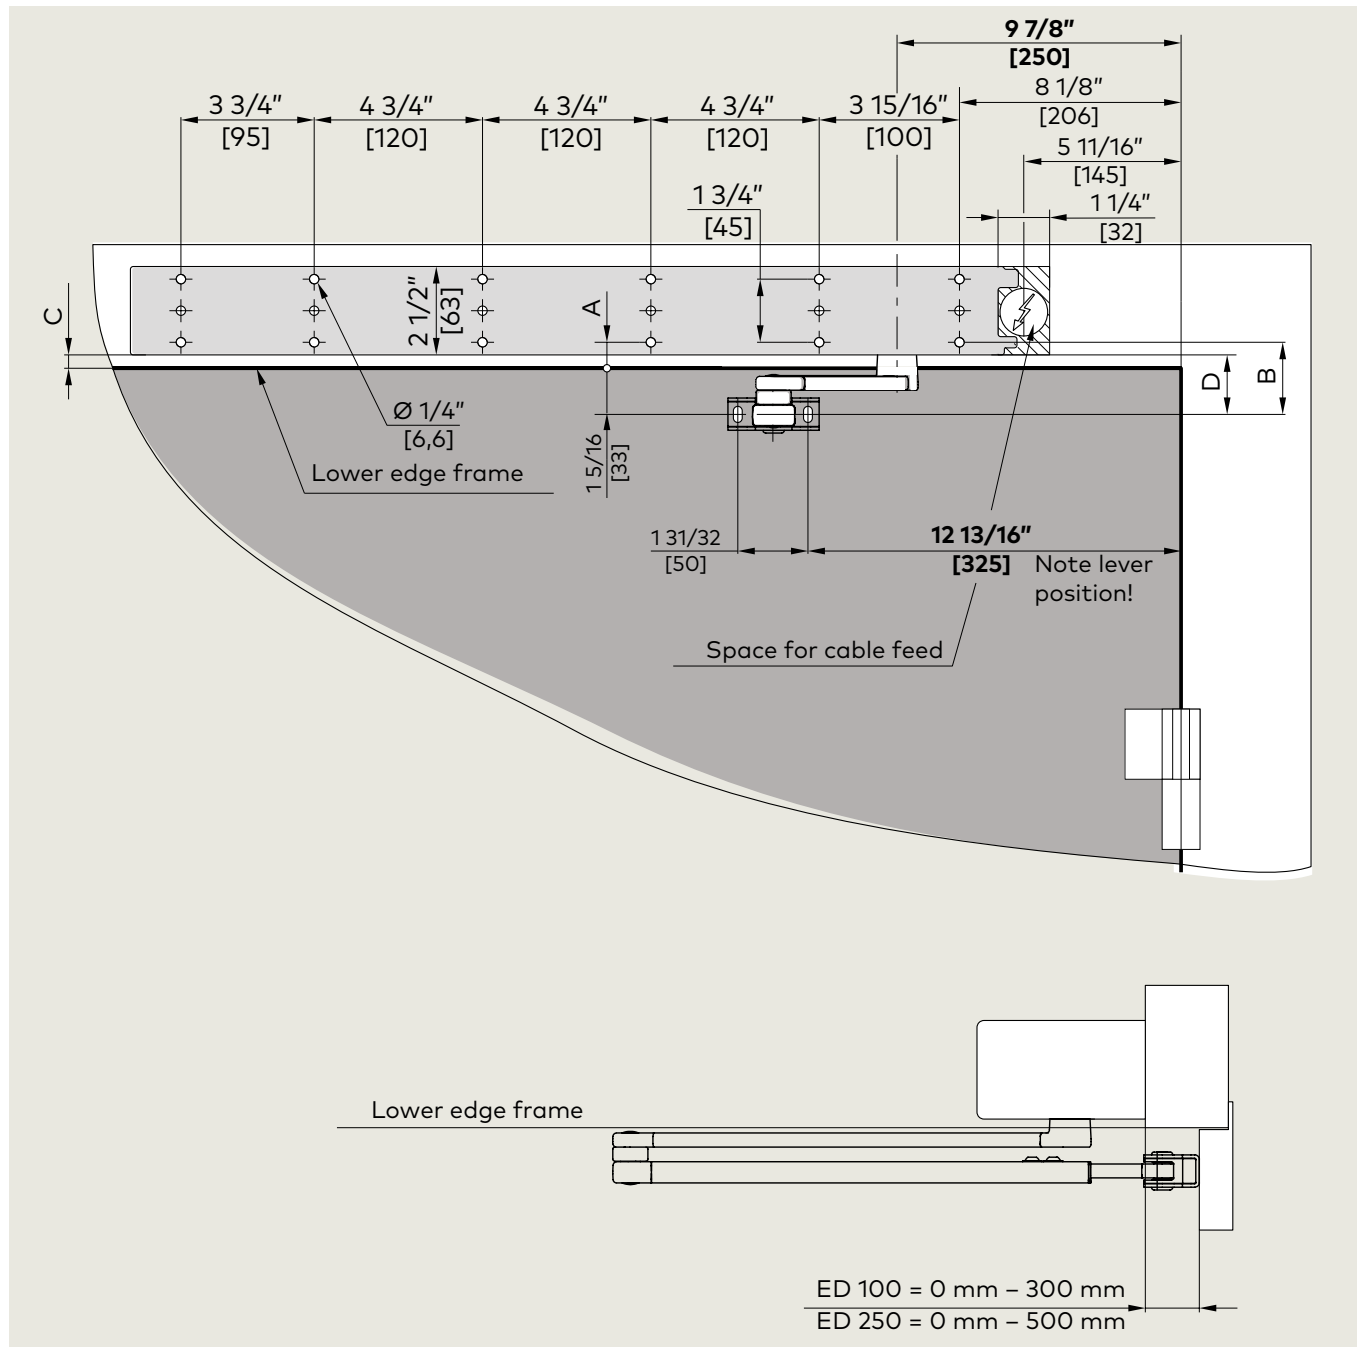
Assembly on opposite hinge side, push version with J/arm assembly
